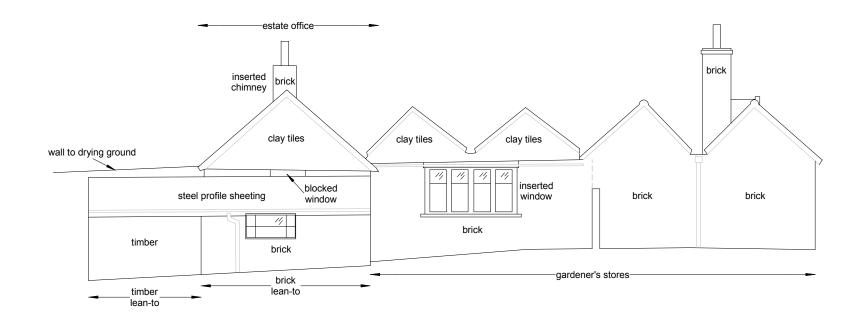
Structures 3 & 3a, 18th-century estate office and gardener's stores north-east elevation.
